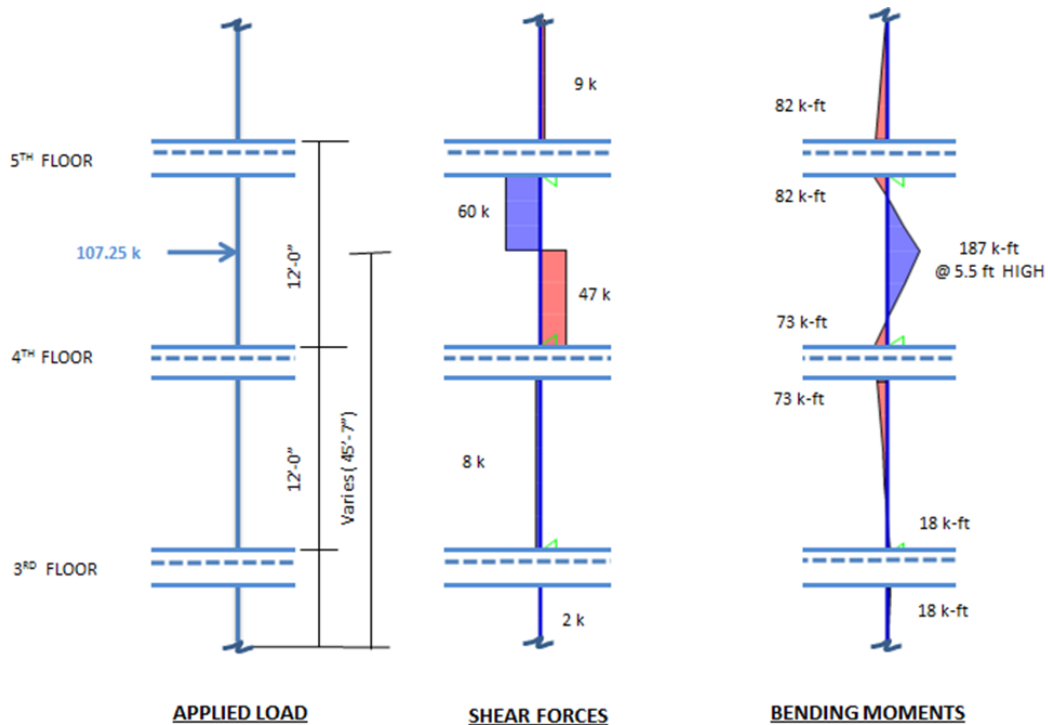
Impact load applied at $d + h_c$ away from the end of column on the 4th floor
